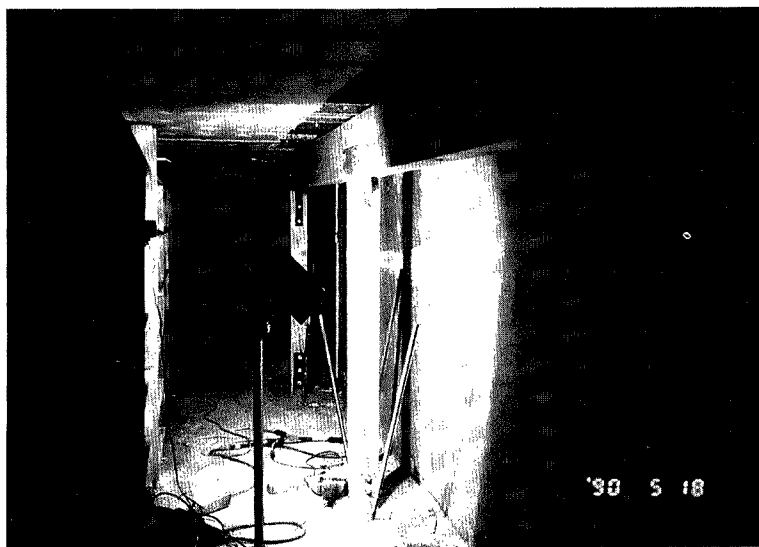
Repair and retrofit works for Leonard Building (photographed on 5/18/90).
